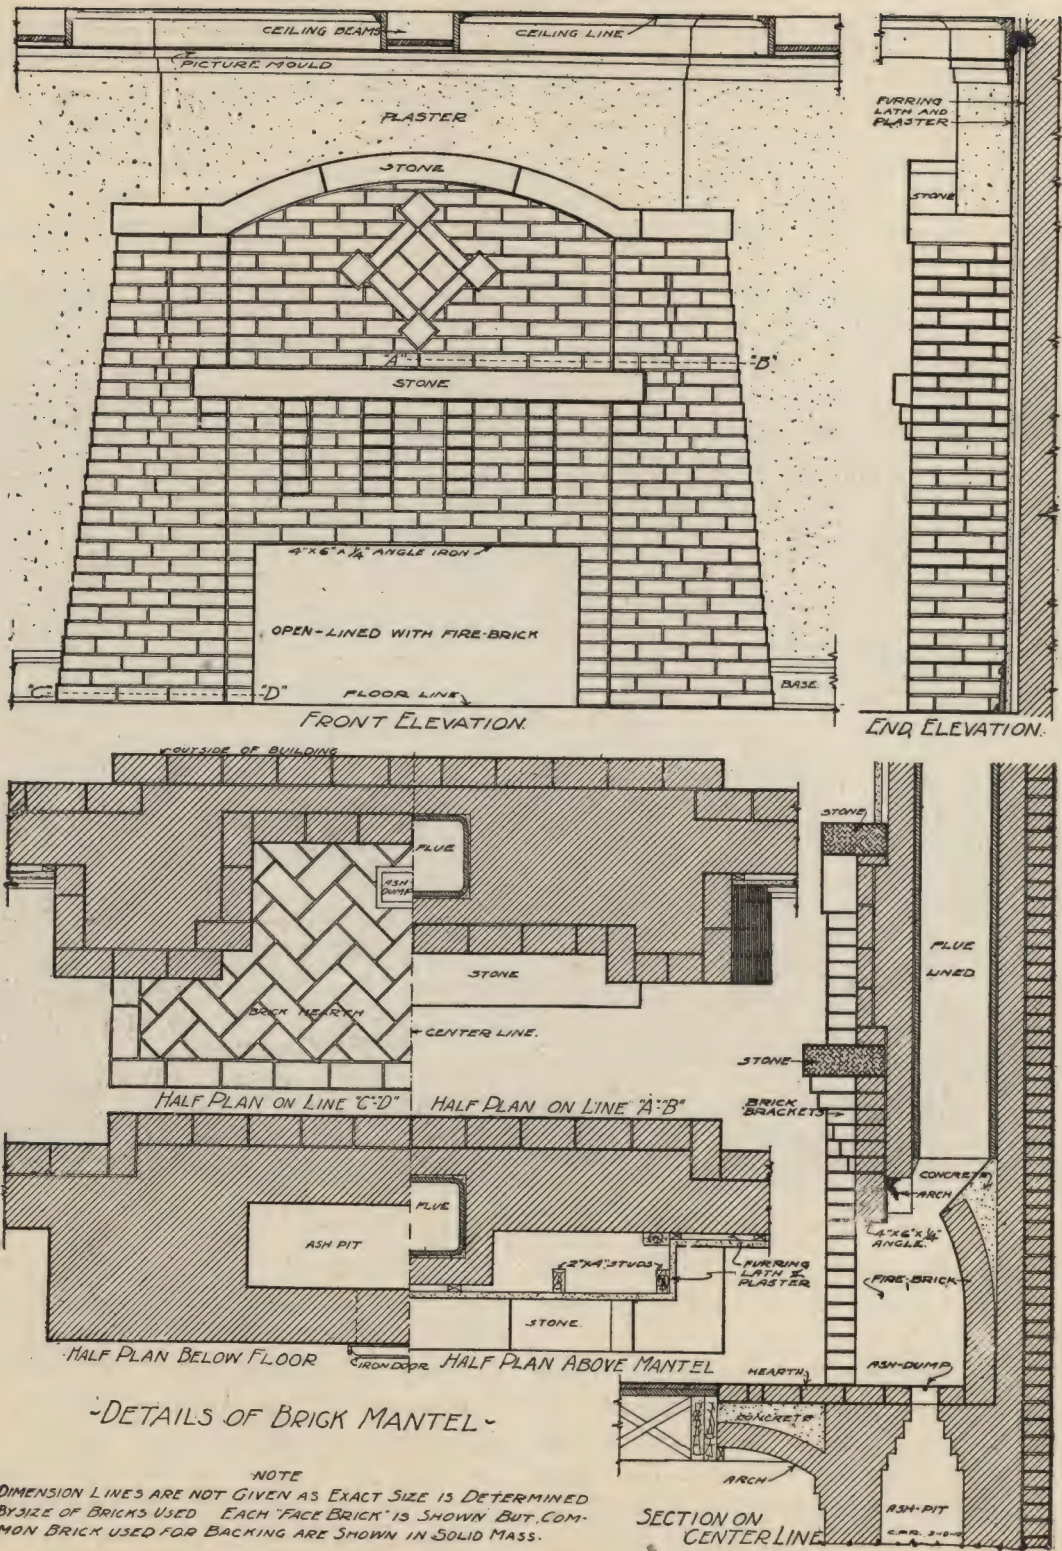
BRICK MANTEL DESIGN AND DETAILS OF FIREPLACE CONSTRUCTION.
